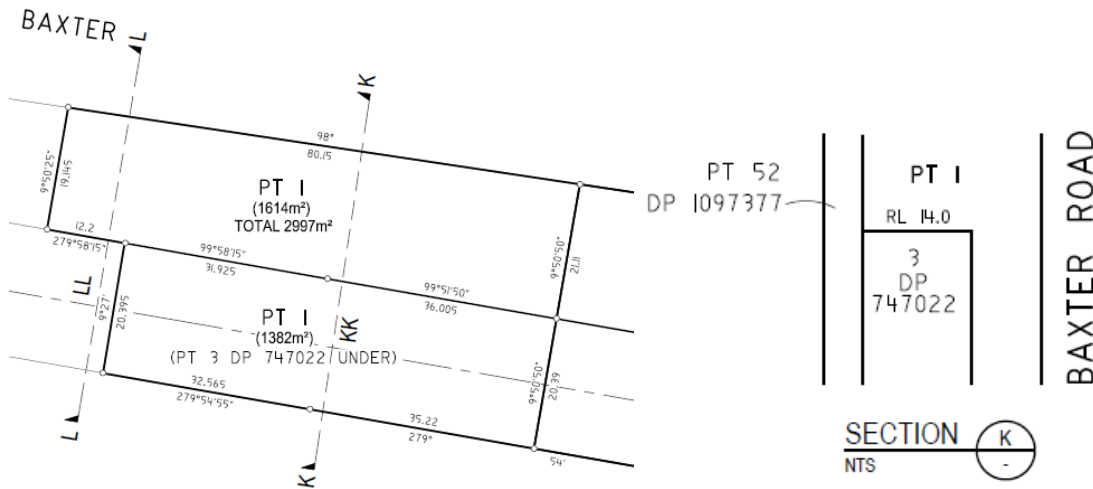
Extracts of the approved plan of subdivision (Source: Calibre Consulting)
